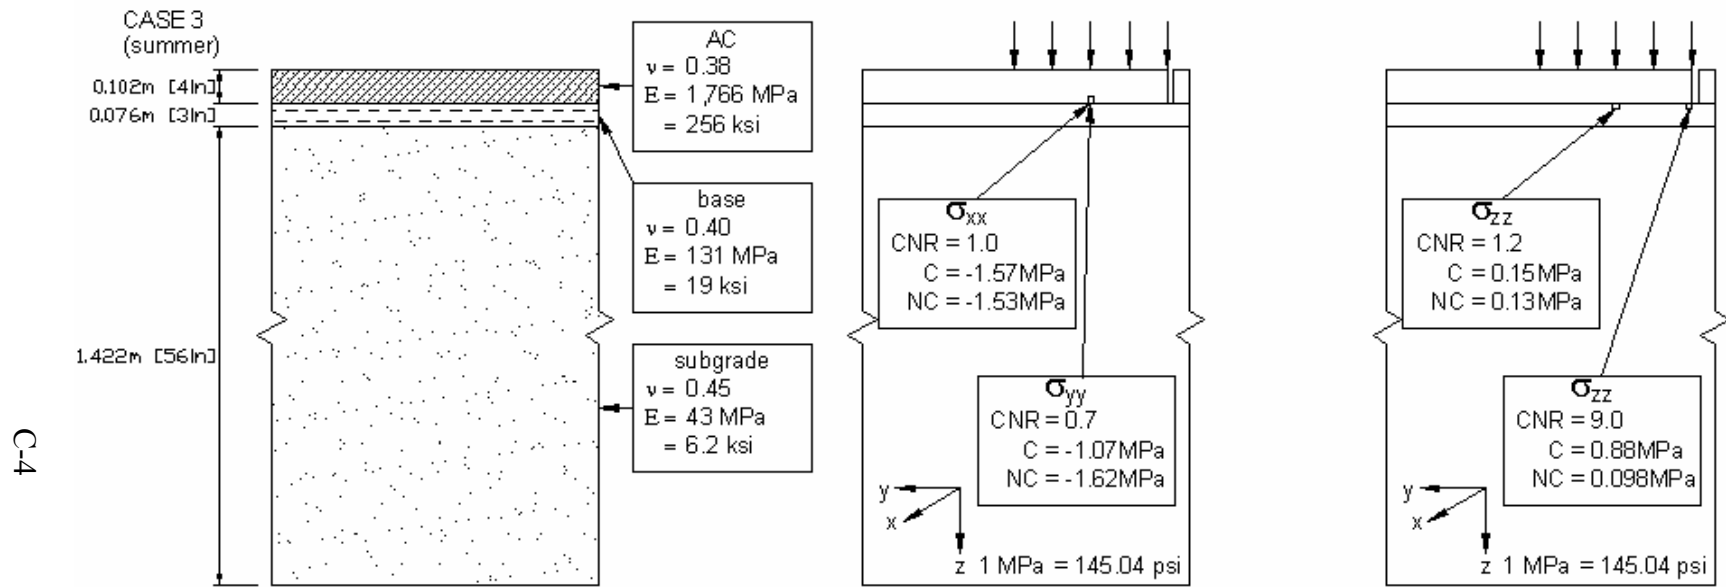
Summary cross section for case 3, (C – stress in cracked pavement, NC – stress in pavement with no crack, CNR – crack/no crack (stress) ratio)
